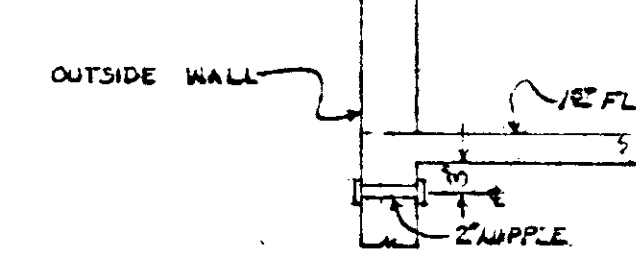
DETAIL OF TELEPHONE CONDUIT FOR END 42 UNIT
